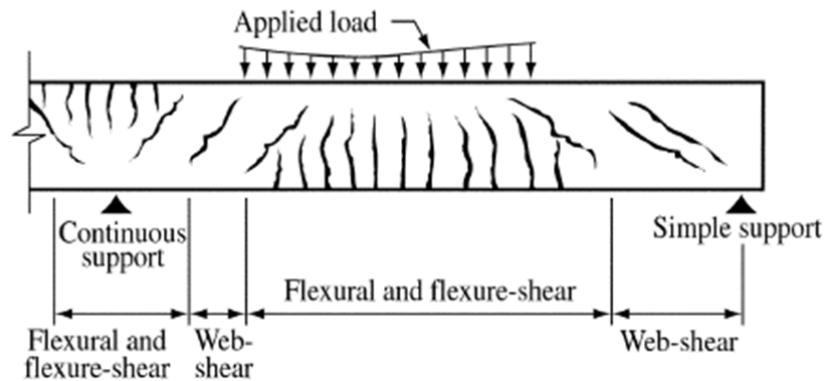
Types of cracks in concrete beams subjected to shear and bending moments (ACI Committee 2011)
